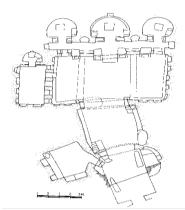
Buckle Church Plan Drawing (Epstein 1986)
